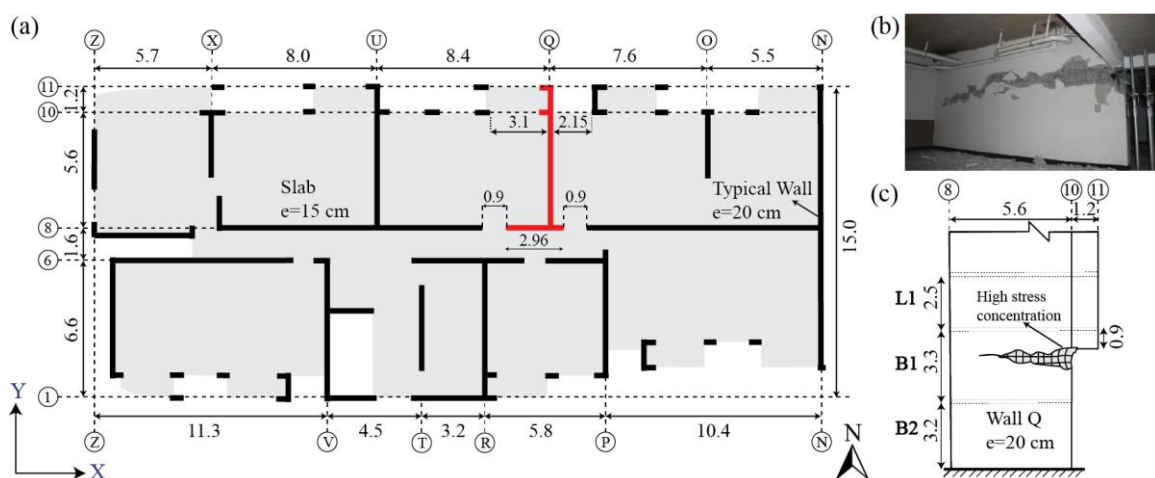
Typical “fish-bone” RC building: (a) floor plan layout (dimensions in meters); (b) typical failure observed after 2010 Chile earthquake (damage information provided by Sopoer & Asociados); (c) elevation of wall Q with typical flag-shape
